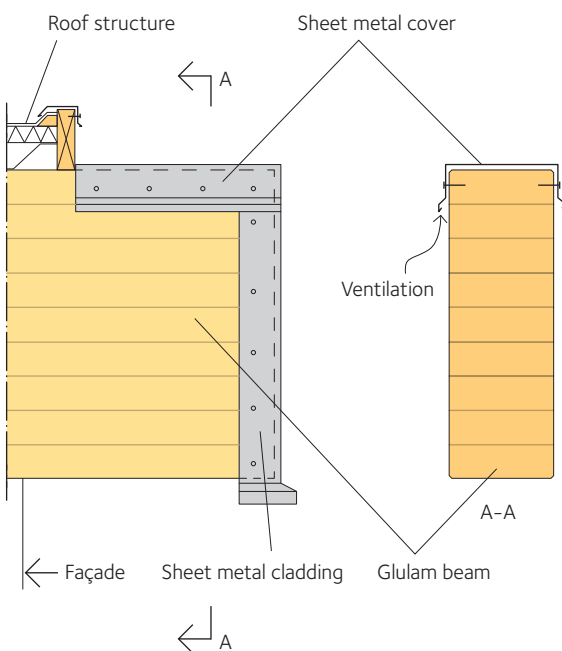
Projecting glulam roof beam with sheet metal cladding on the façade
